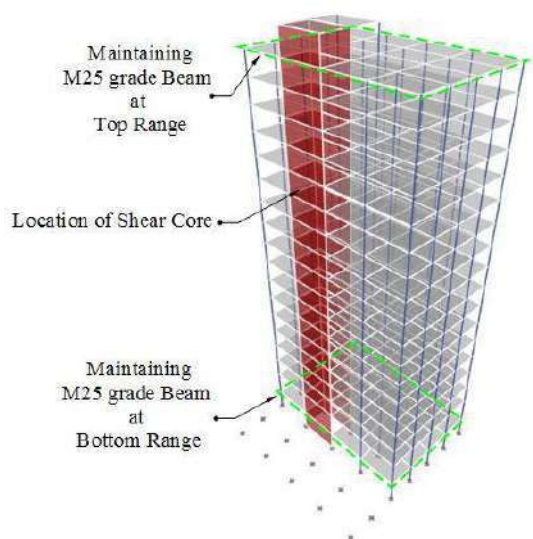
Beam Stability Case - Beams of same sizes (All M25 grade beams): Case BS1
